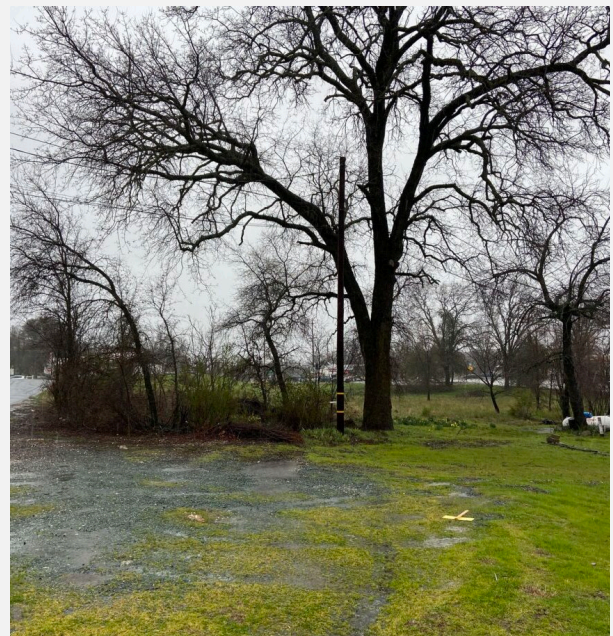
Existing Site Views, North-Facing from Mill Street
